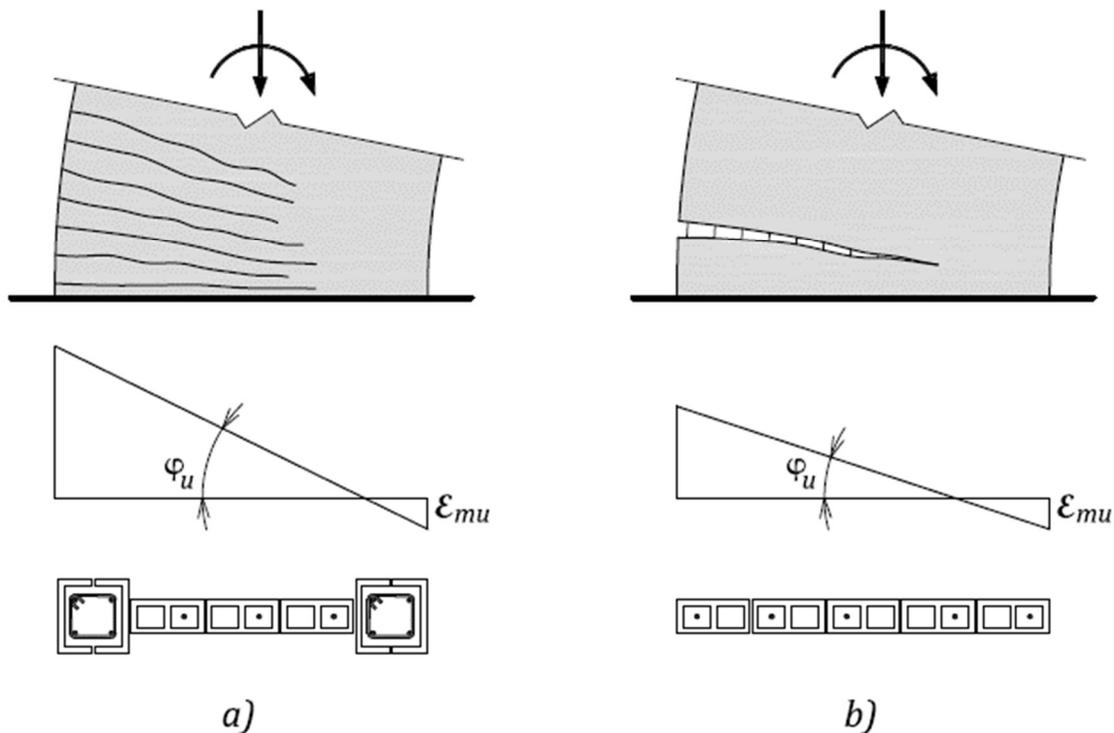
Curvature and cracking pattern in RM shear walls: a) a wall with boundary elements, and b) a rectangular wall without boundary elements.
